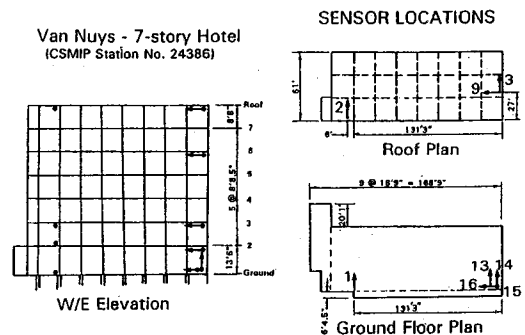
Plan view of Van Nuys 7-story building and location of accelerometers on ground floor and roof.
